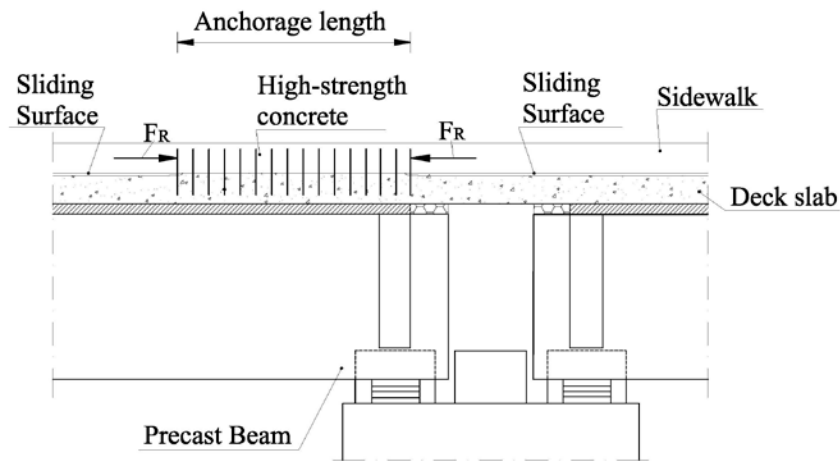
Anchoring of the sidewalks at the deck slab over the central pier
